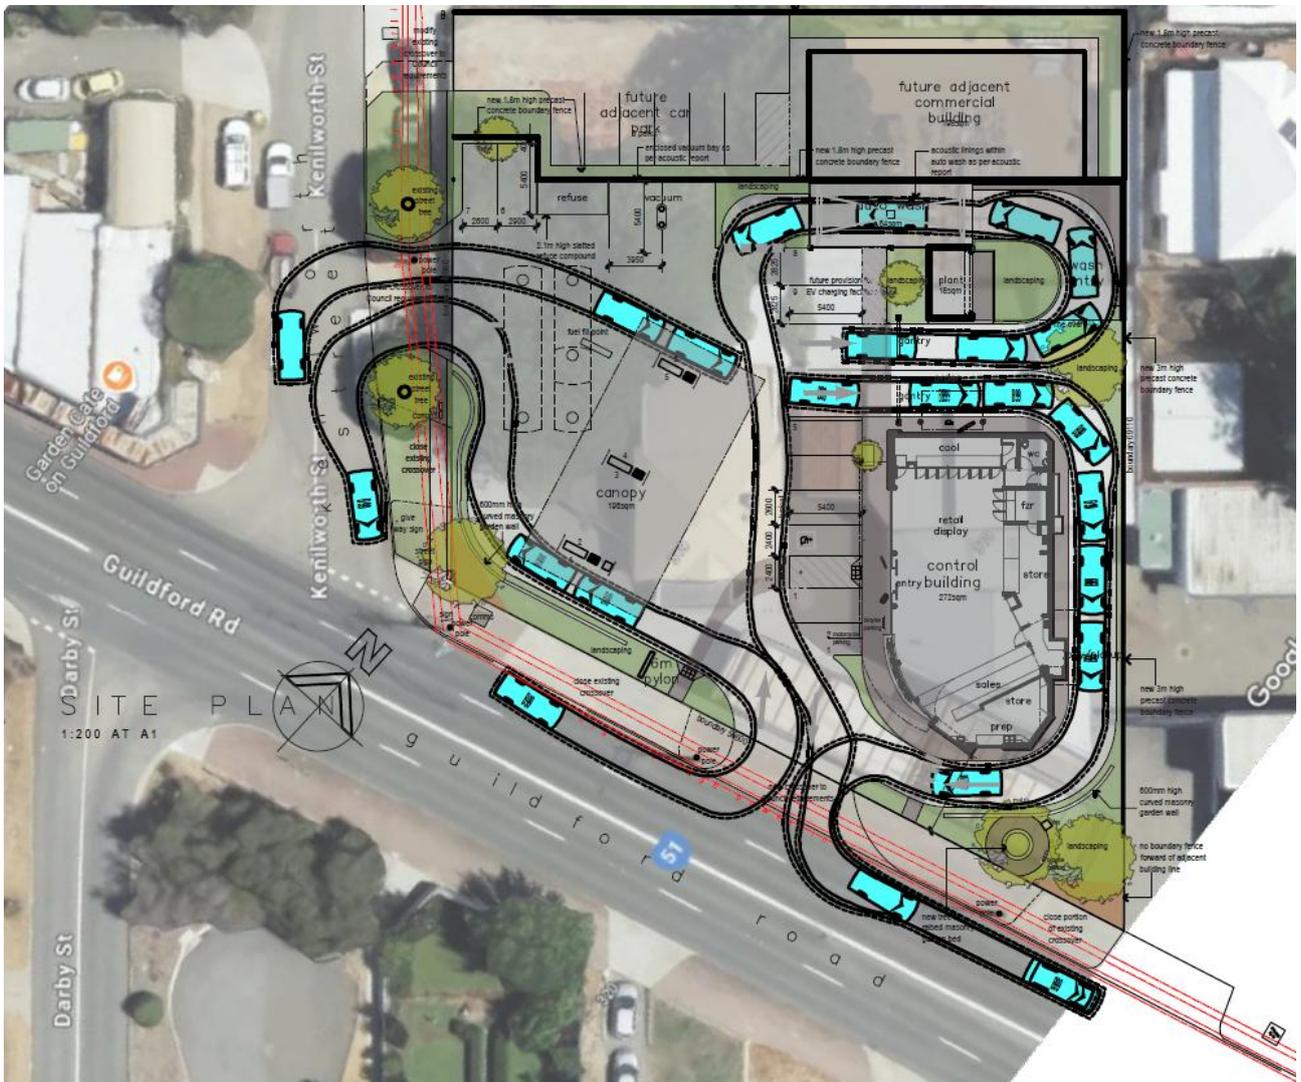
Swept path assessment of B99 Design Car with existing layout
